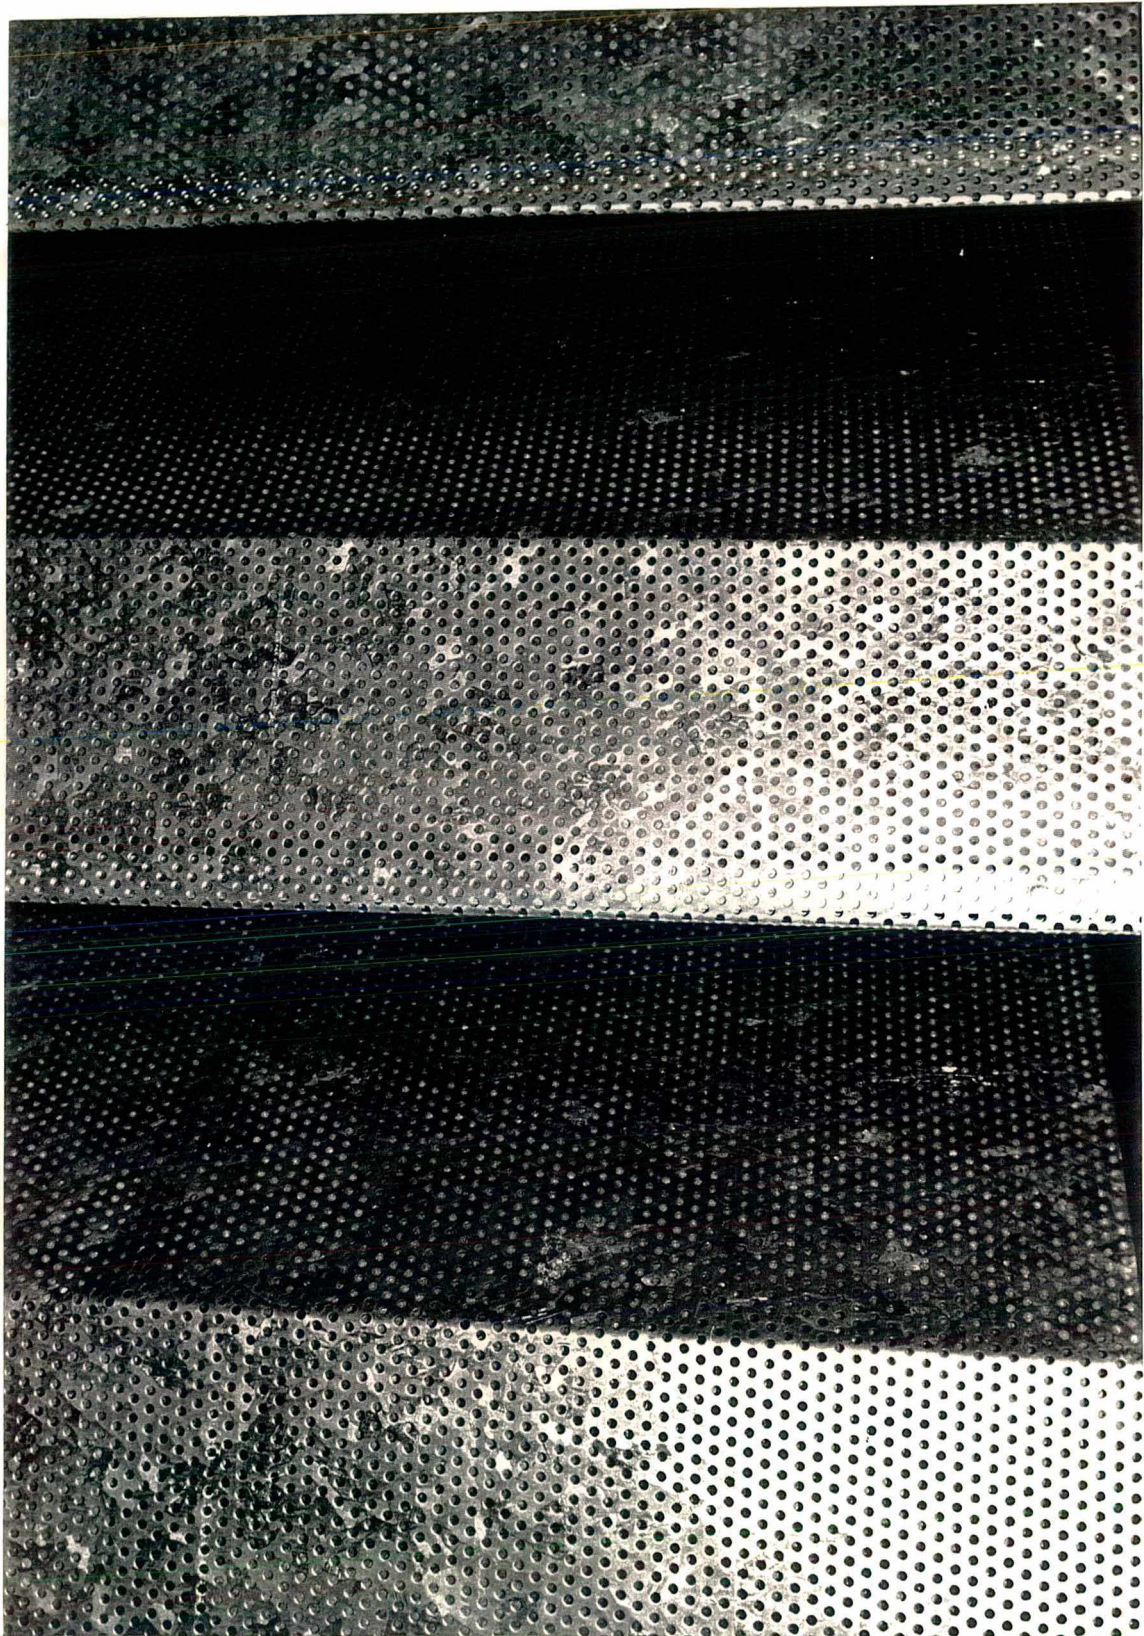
Internal view of the louvre: perforated steel sheet with mineral wool infill.
